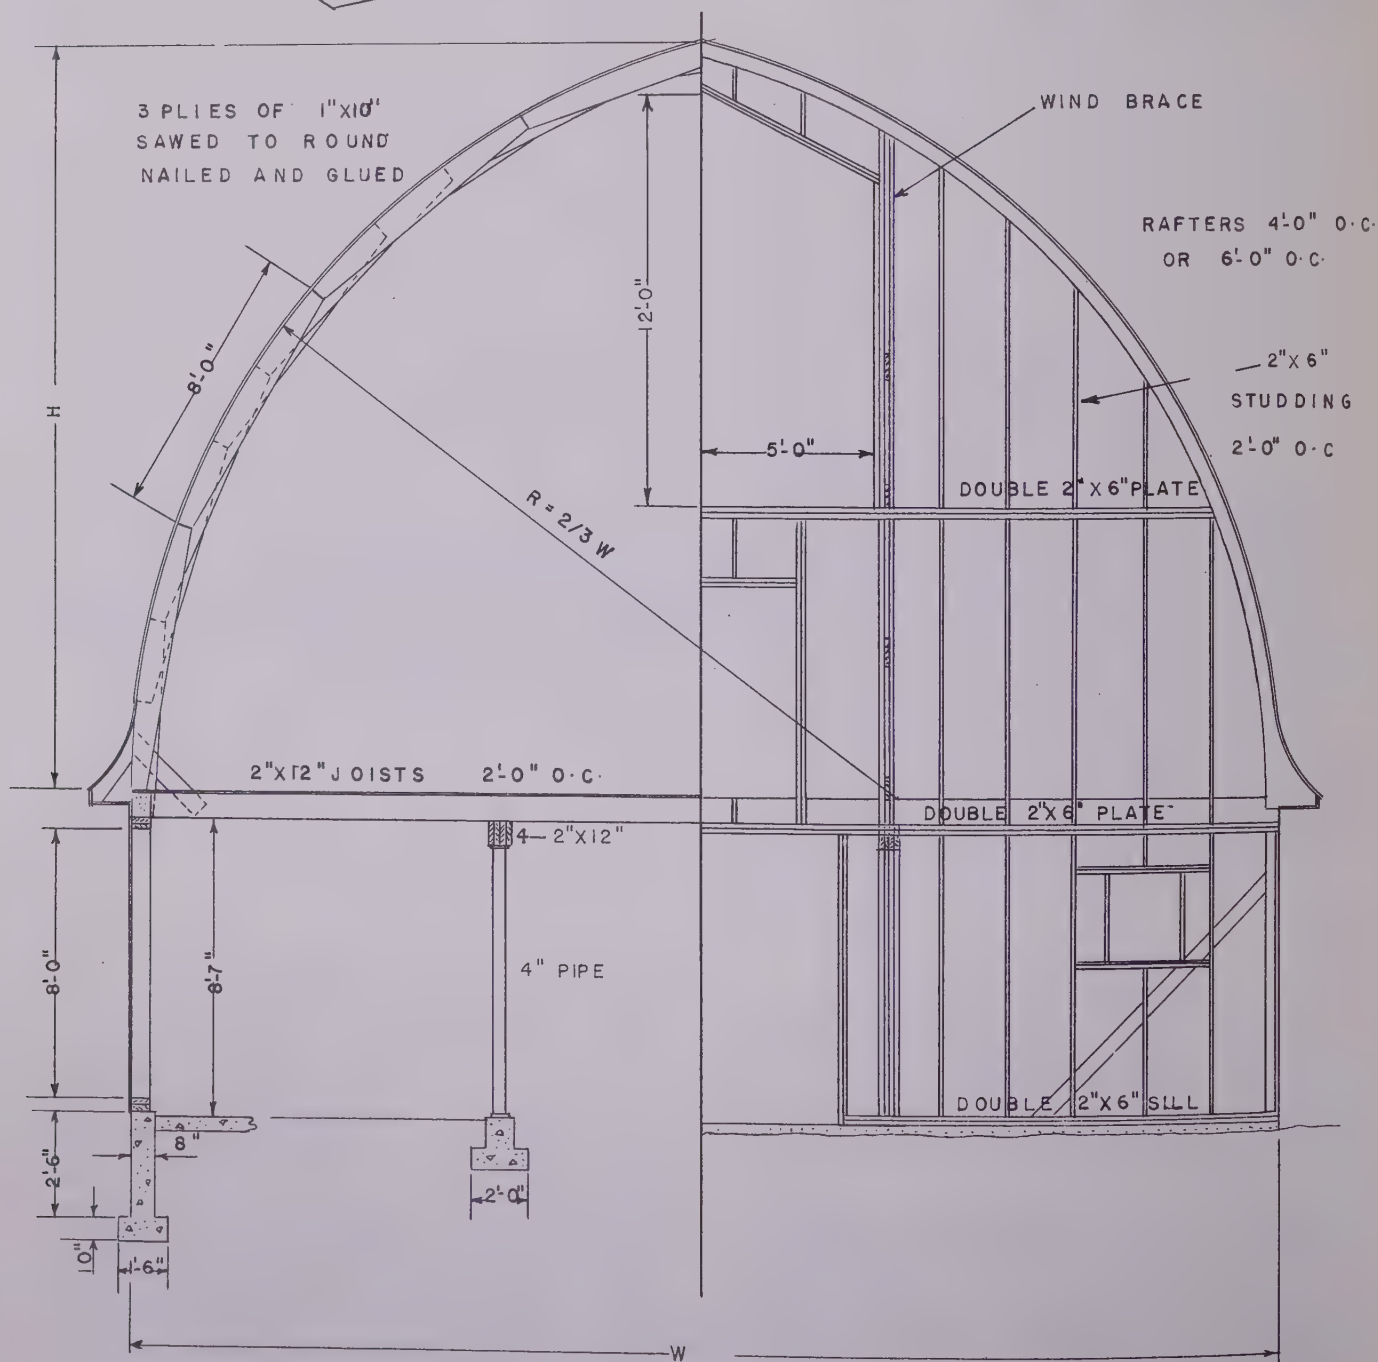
Half section and half end framing of Gothic-roofed barn.
